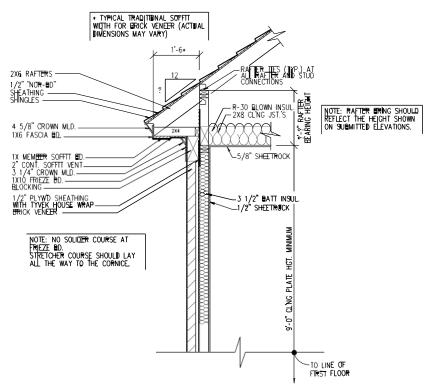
DETAIL AT HIP ROOF (PITCH, CORNICE, OVERHANG, ETC.)
